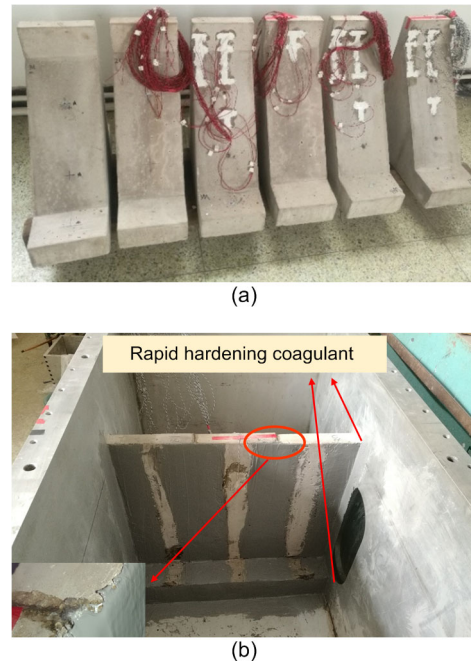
Concrete dam model of centrifuge tests: (a) dam model; (b) model installation
